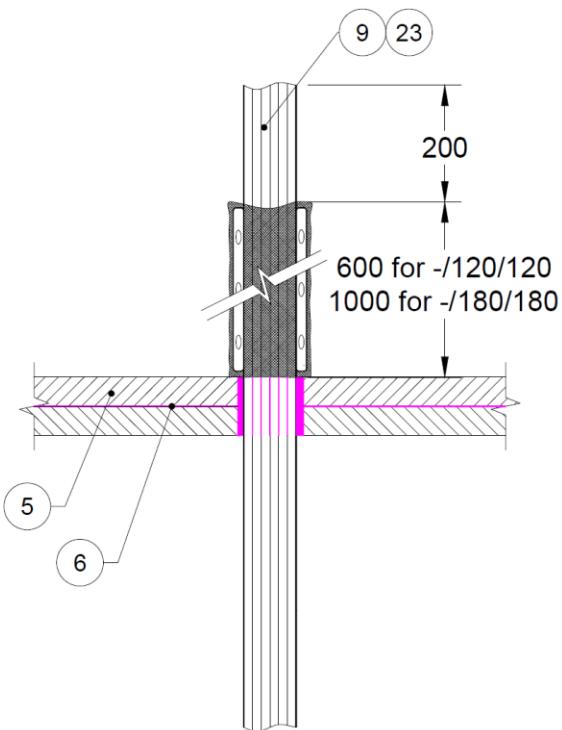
Section View of D1 and D2 Cables with/without Cable Trays in TBA Firefly™ Intubatt not against Wall Construction in Horizontal Substrates
